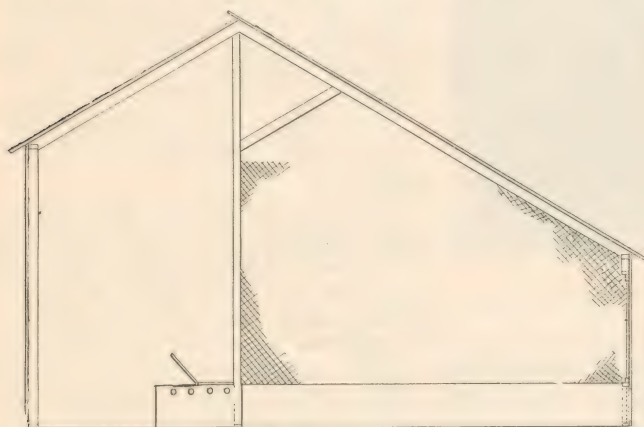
SHOWING CROSS SECTION OF BROODER HOUSE AND INTERIOR ARRANGEMENT.
